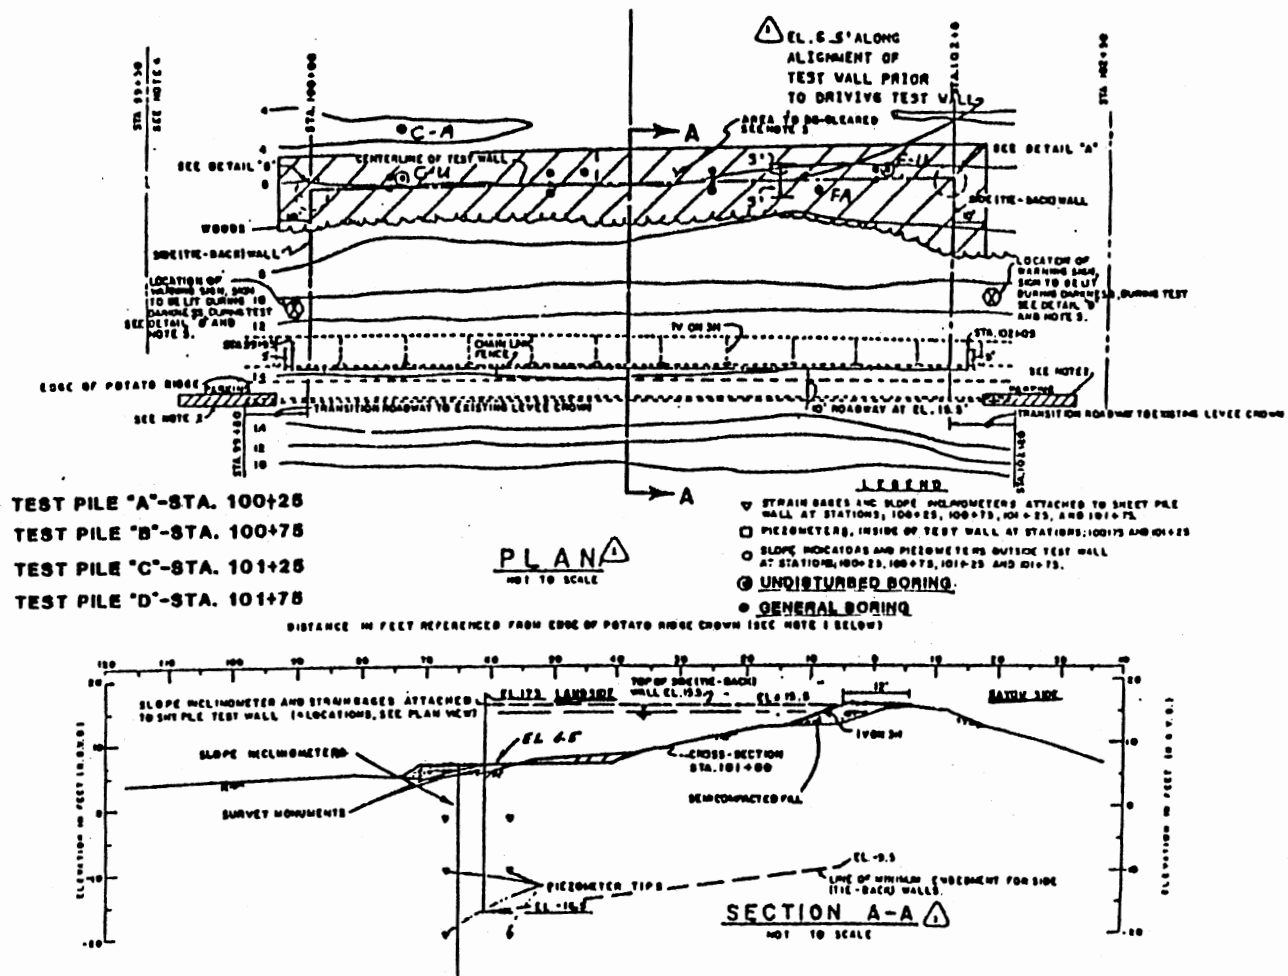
Plan and Profile of E99 wall (Ref. 14)
